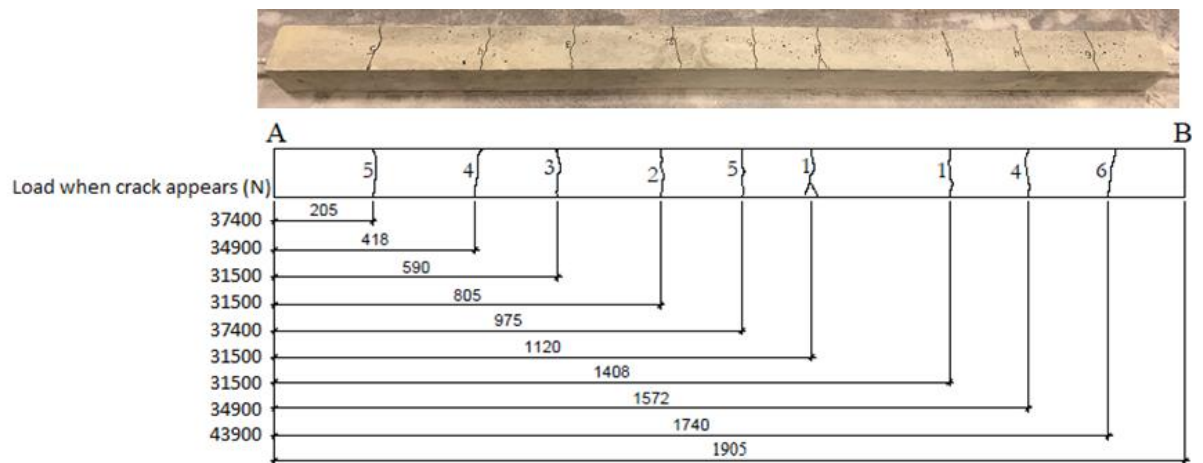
Prism test and crack pattern: #4 rGFRP – specimen 2.
